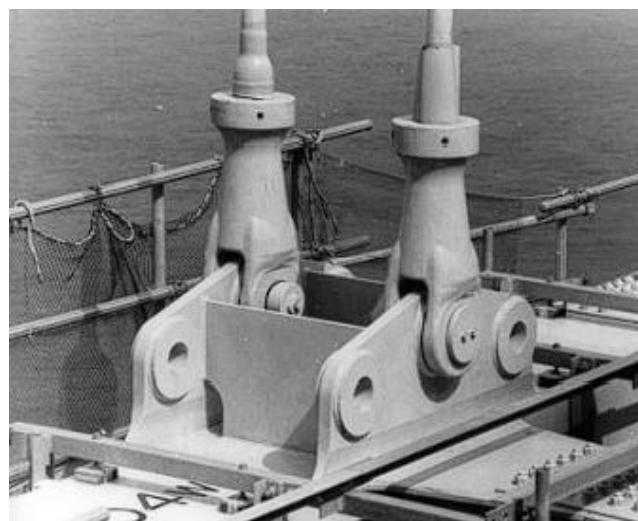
Anchorage system with eye bars of the Asashi Kaikyo Bridge
